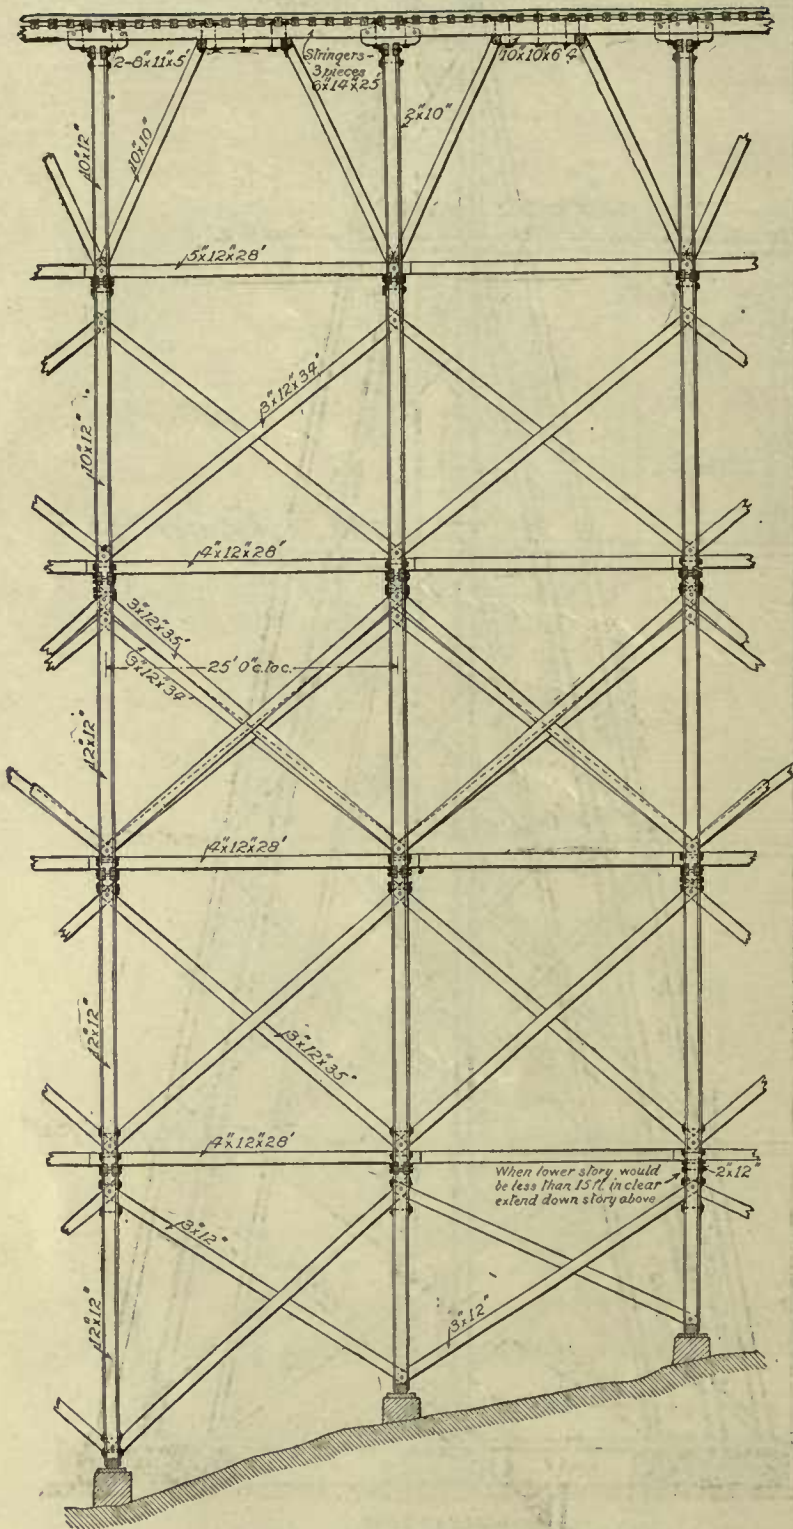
ELEVATION HIGH OR MULTIPLE STORY TRESTLE.
